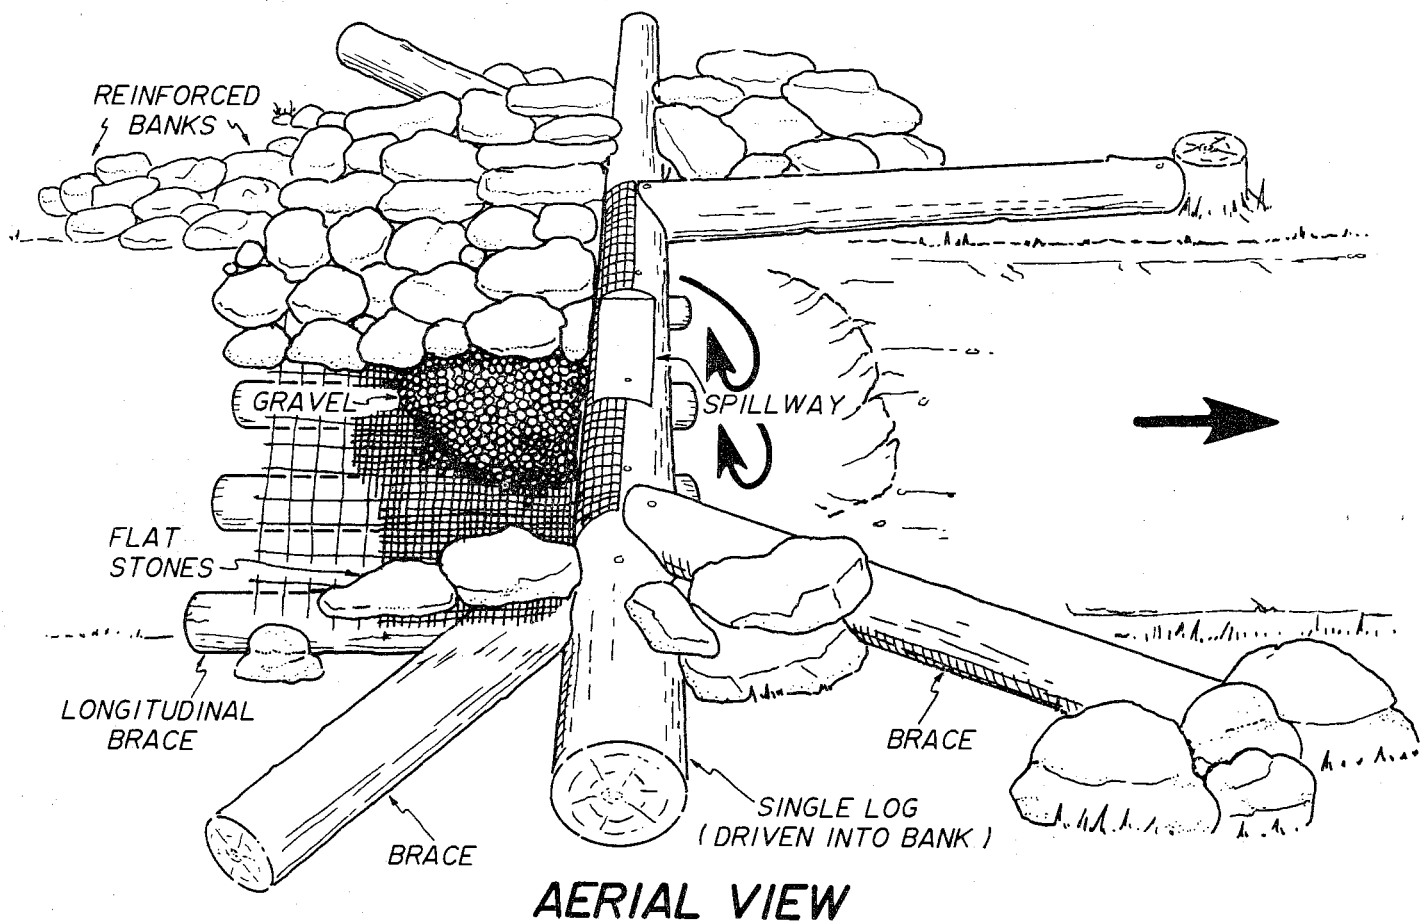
SINGLE LOG DAM WITH FLAT STONES INSTEAD OF PLANK FLOOR.
